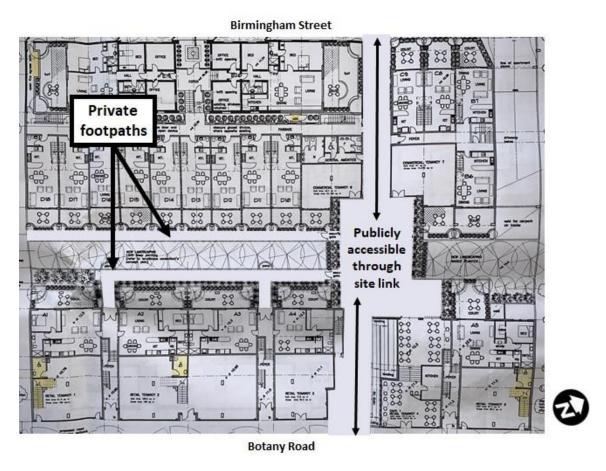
Ground floor plan of neighbouring development at 662-674 Botany Road.
